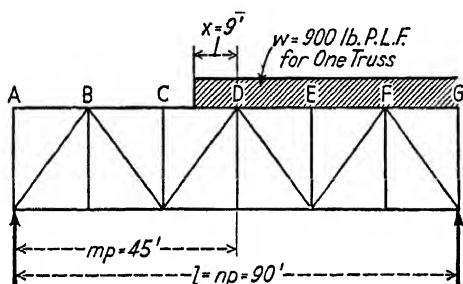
Shear in a Truss Panel Due to Uniform Load.
